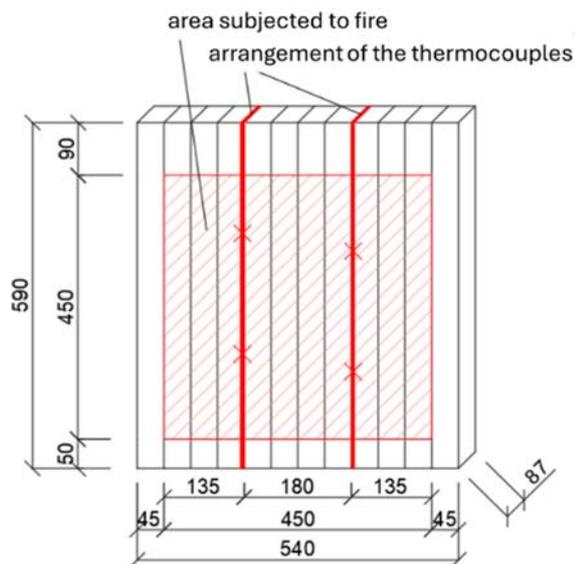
Drawing of the fire test specimens (Nicole Ebert)
